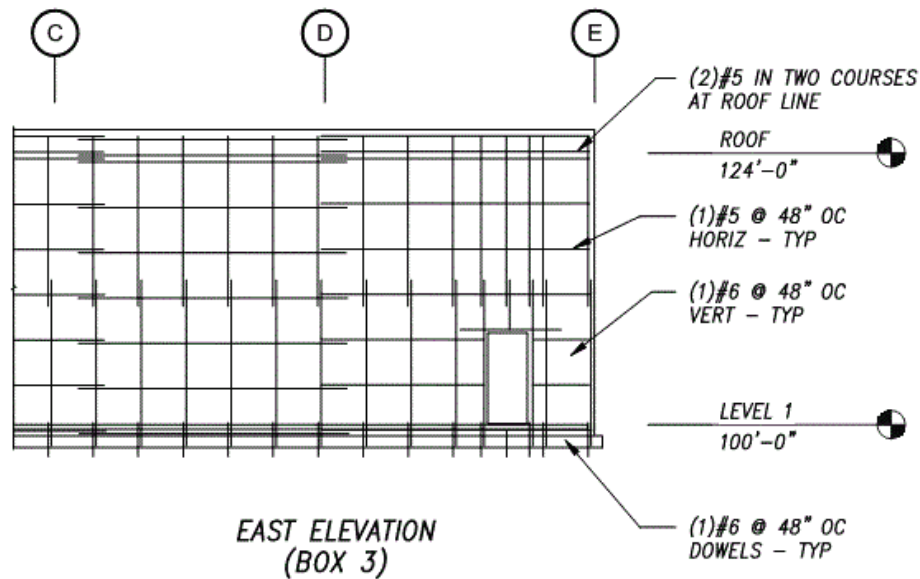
Single-story retail/industrial/warehouse building East elevation: BOX3.
